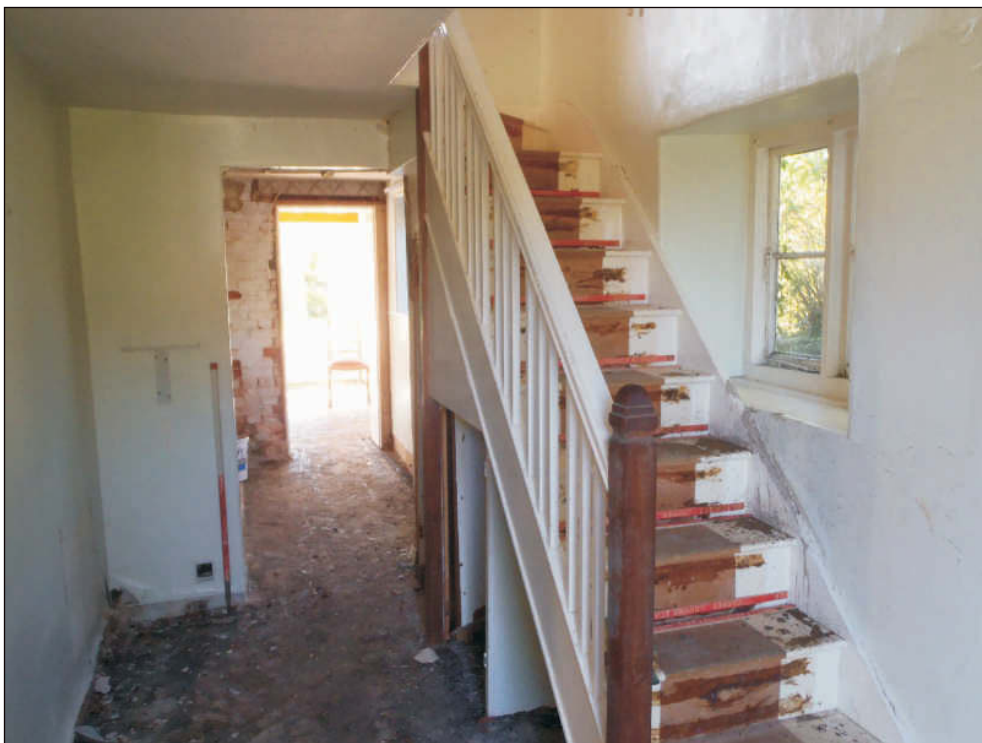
Entrance hallway with inserted staircase, viewed from the northwest. Scale 1m.
